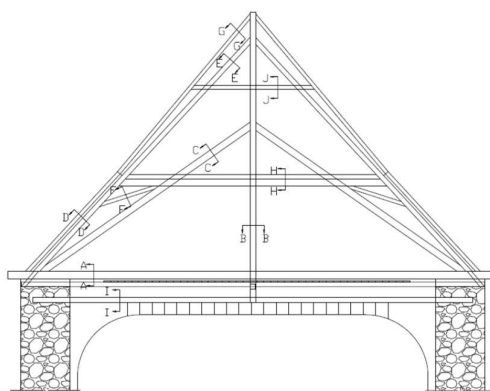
Timber roof schematic showing false vault ceiling [10]
